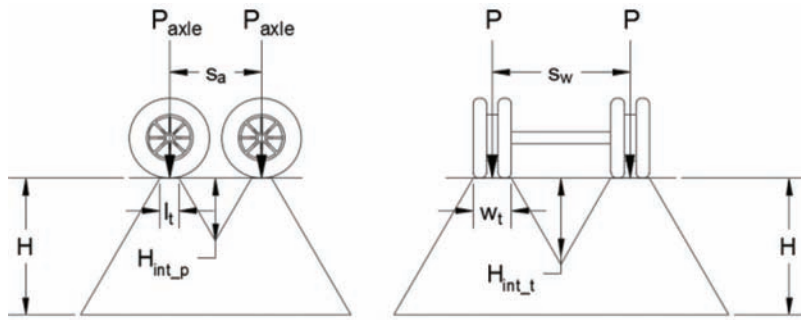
Longitudinal and transverse view of HL-93 design tandem, one lane loaded.
